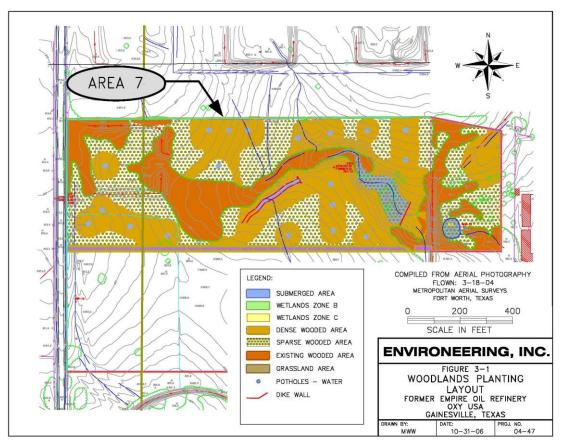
Riparian enhancement planting from Figure 3-1 in the Final Construction Report.
